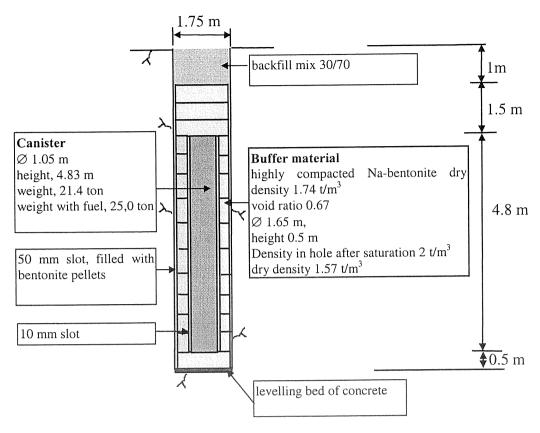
Schematic view of the deposition holes in the Prototype Repository.
